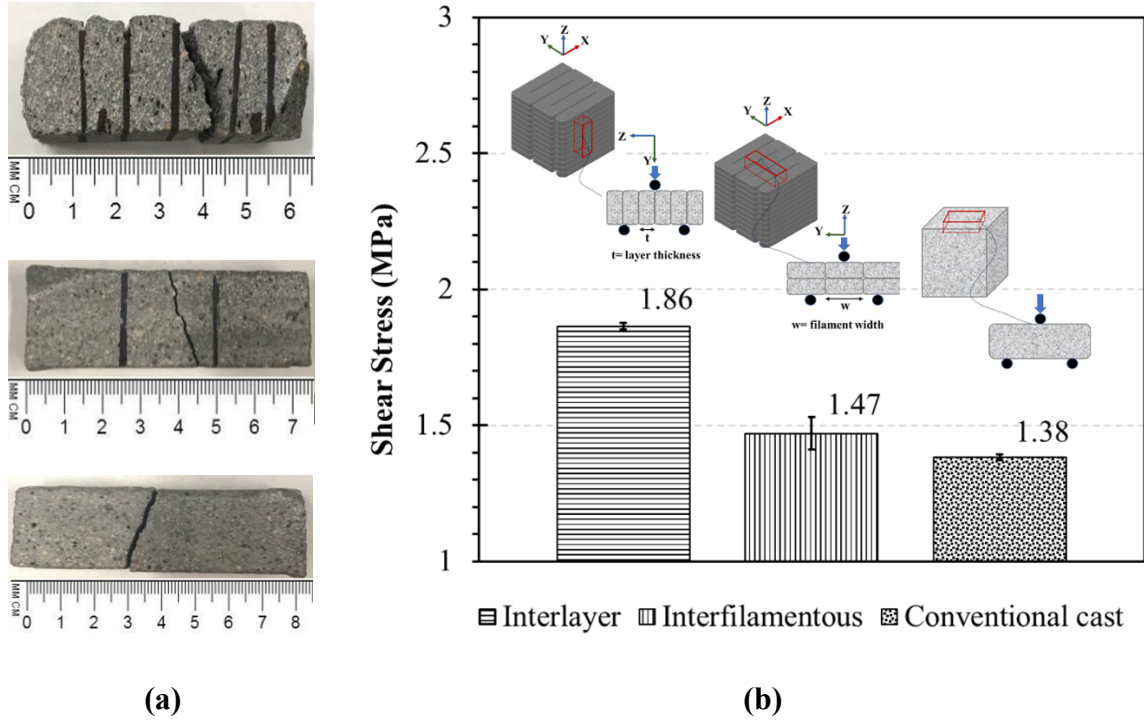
Short shear beam testing of 3D printed concrete and regularly cast concrete. (a) The shear failure mode of both 3D printed concrete and conventionally cast concrete. (b) Shear strength of interlayer interface, interfilamentous interface, and convention
